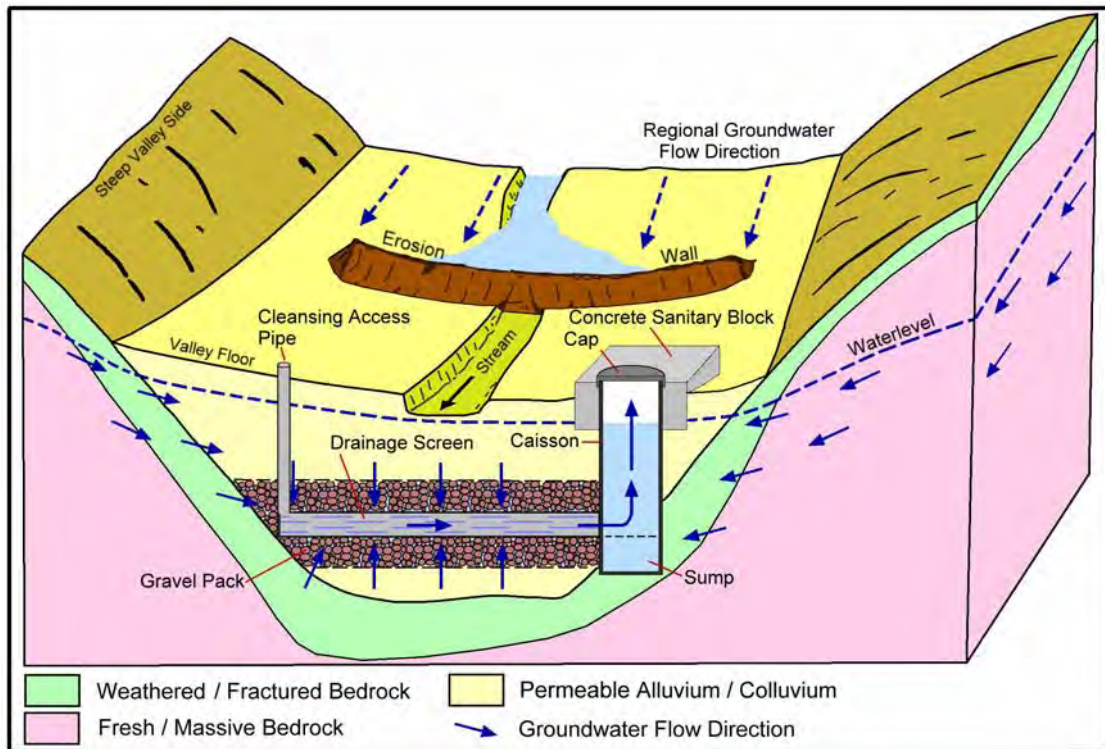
Schematic plan of a collector well system (Woodford, 2000)
